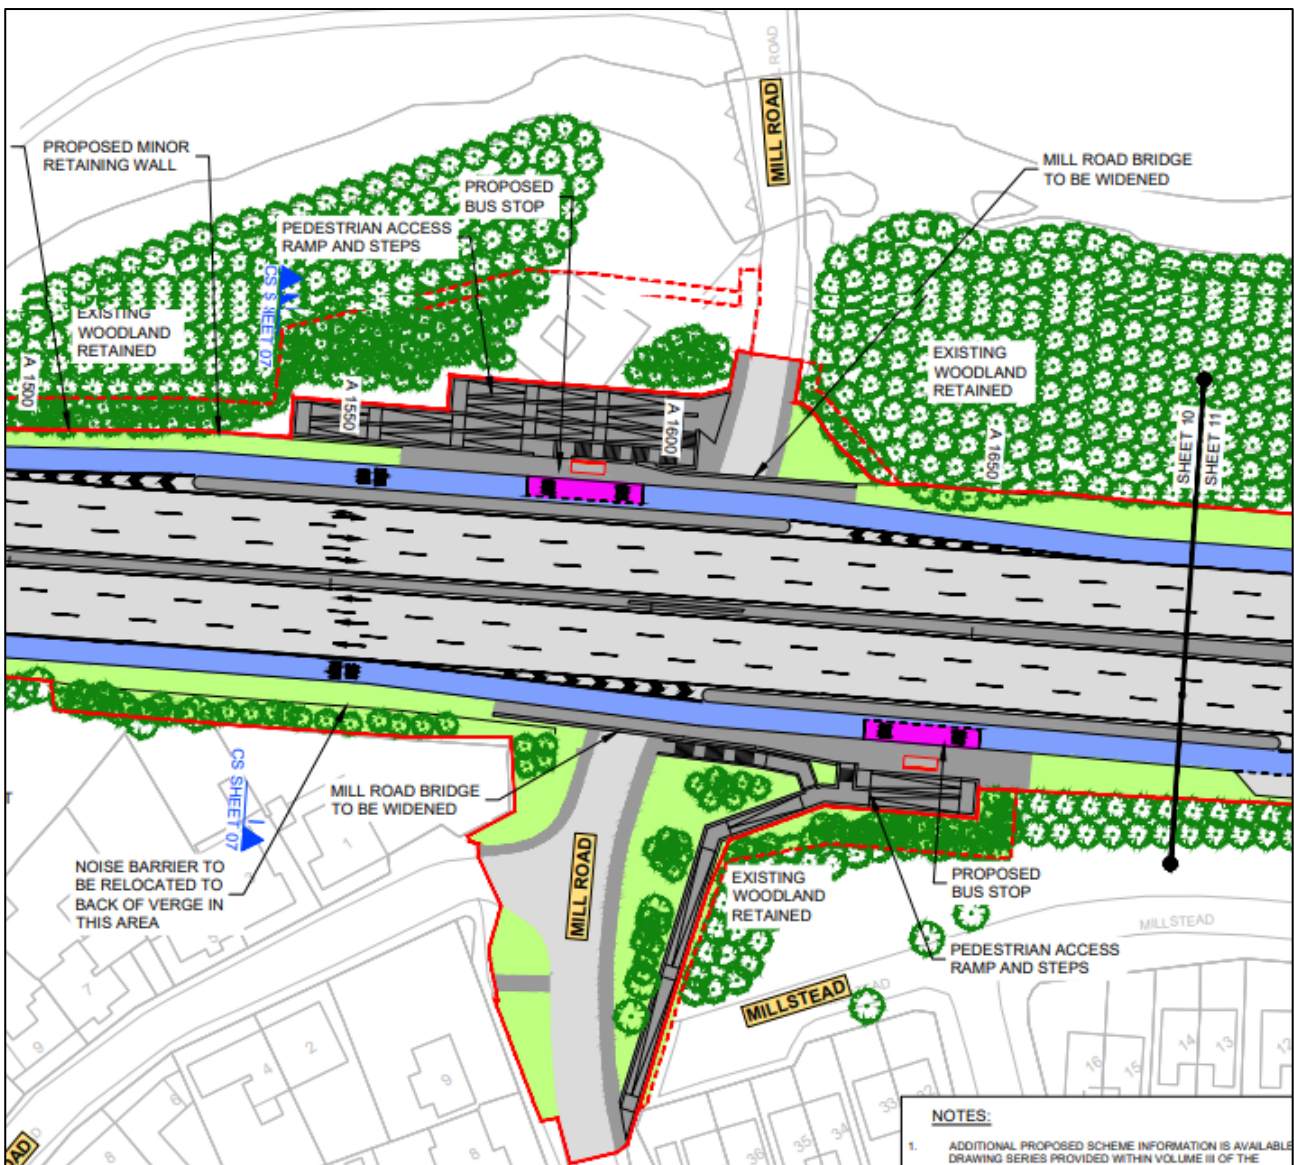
Extract from General Arrangement Drawing at Mill Road
